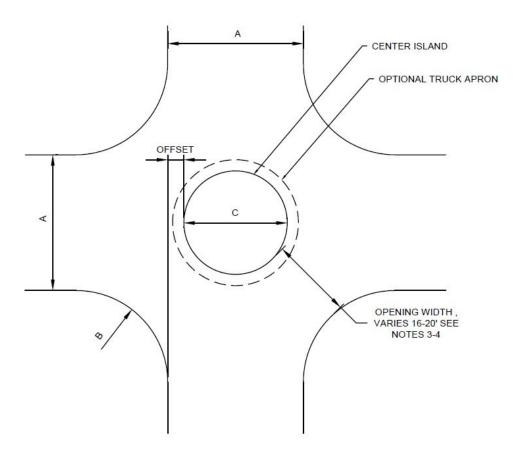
Typical Layout and Standard Dimensions of Traffic Circle
